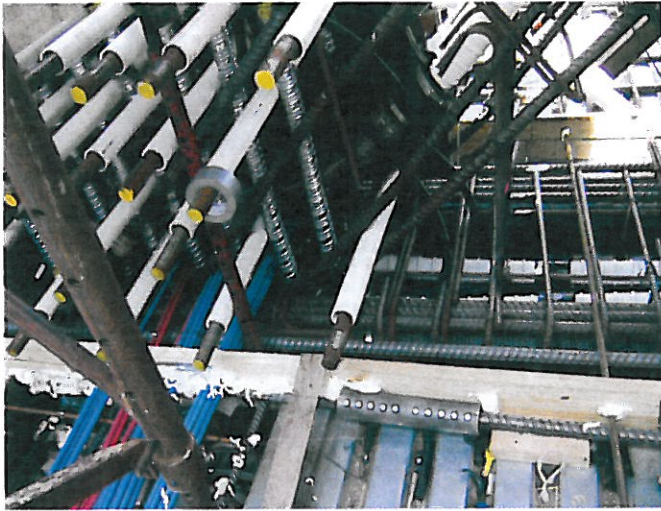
Accurate detailing and constructibility reviews were essential. Shown in this photo of a joint at the center of a bottom chord are longitudinal reinforcing bars, transverse reinforcement, unbonded PT strand for the transverse floor beams (red and blue), bonded PT ducts (white and silver), high-strength PT bars to resist general zone bursting forces (yellow ends), and a cheek plate
